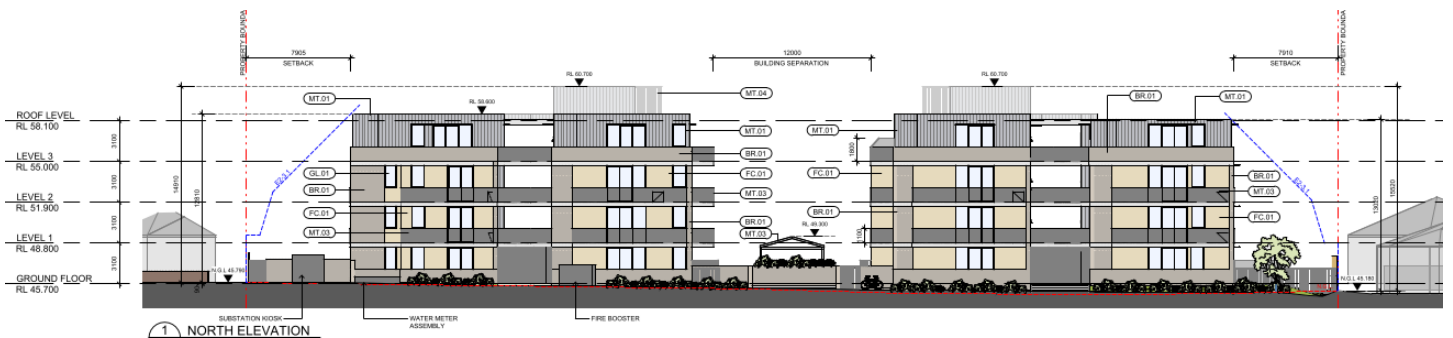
Diagram of streetscape elevation showing the overall building height with compliant side setbacks and appropriate separation
